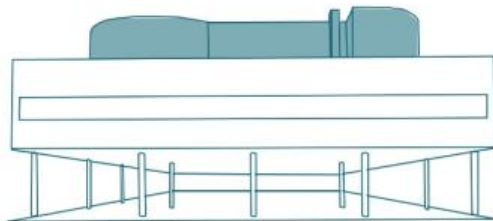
5 POINTS OF NEW ARCHITECTURE (RABII, 2021)
